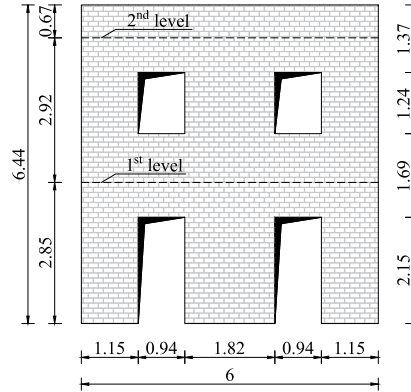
Geometry of the 'Door wall' prototype (dimensions in m).
